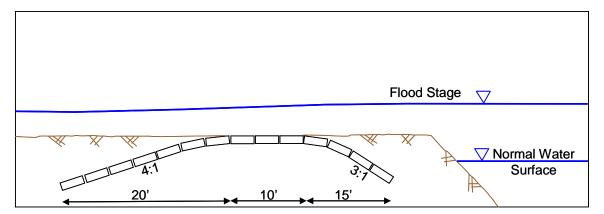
Recommended layout detail for ACB bank armor, cross section A-A' from Figure 4.20 above.
